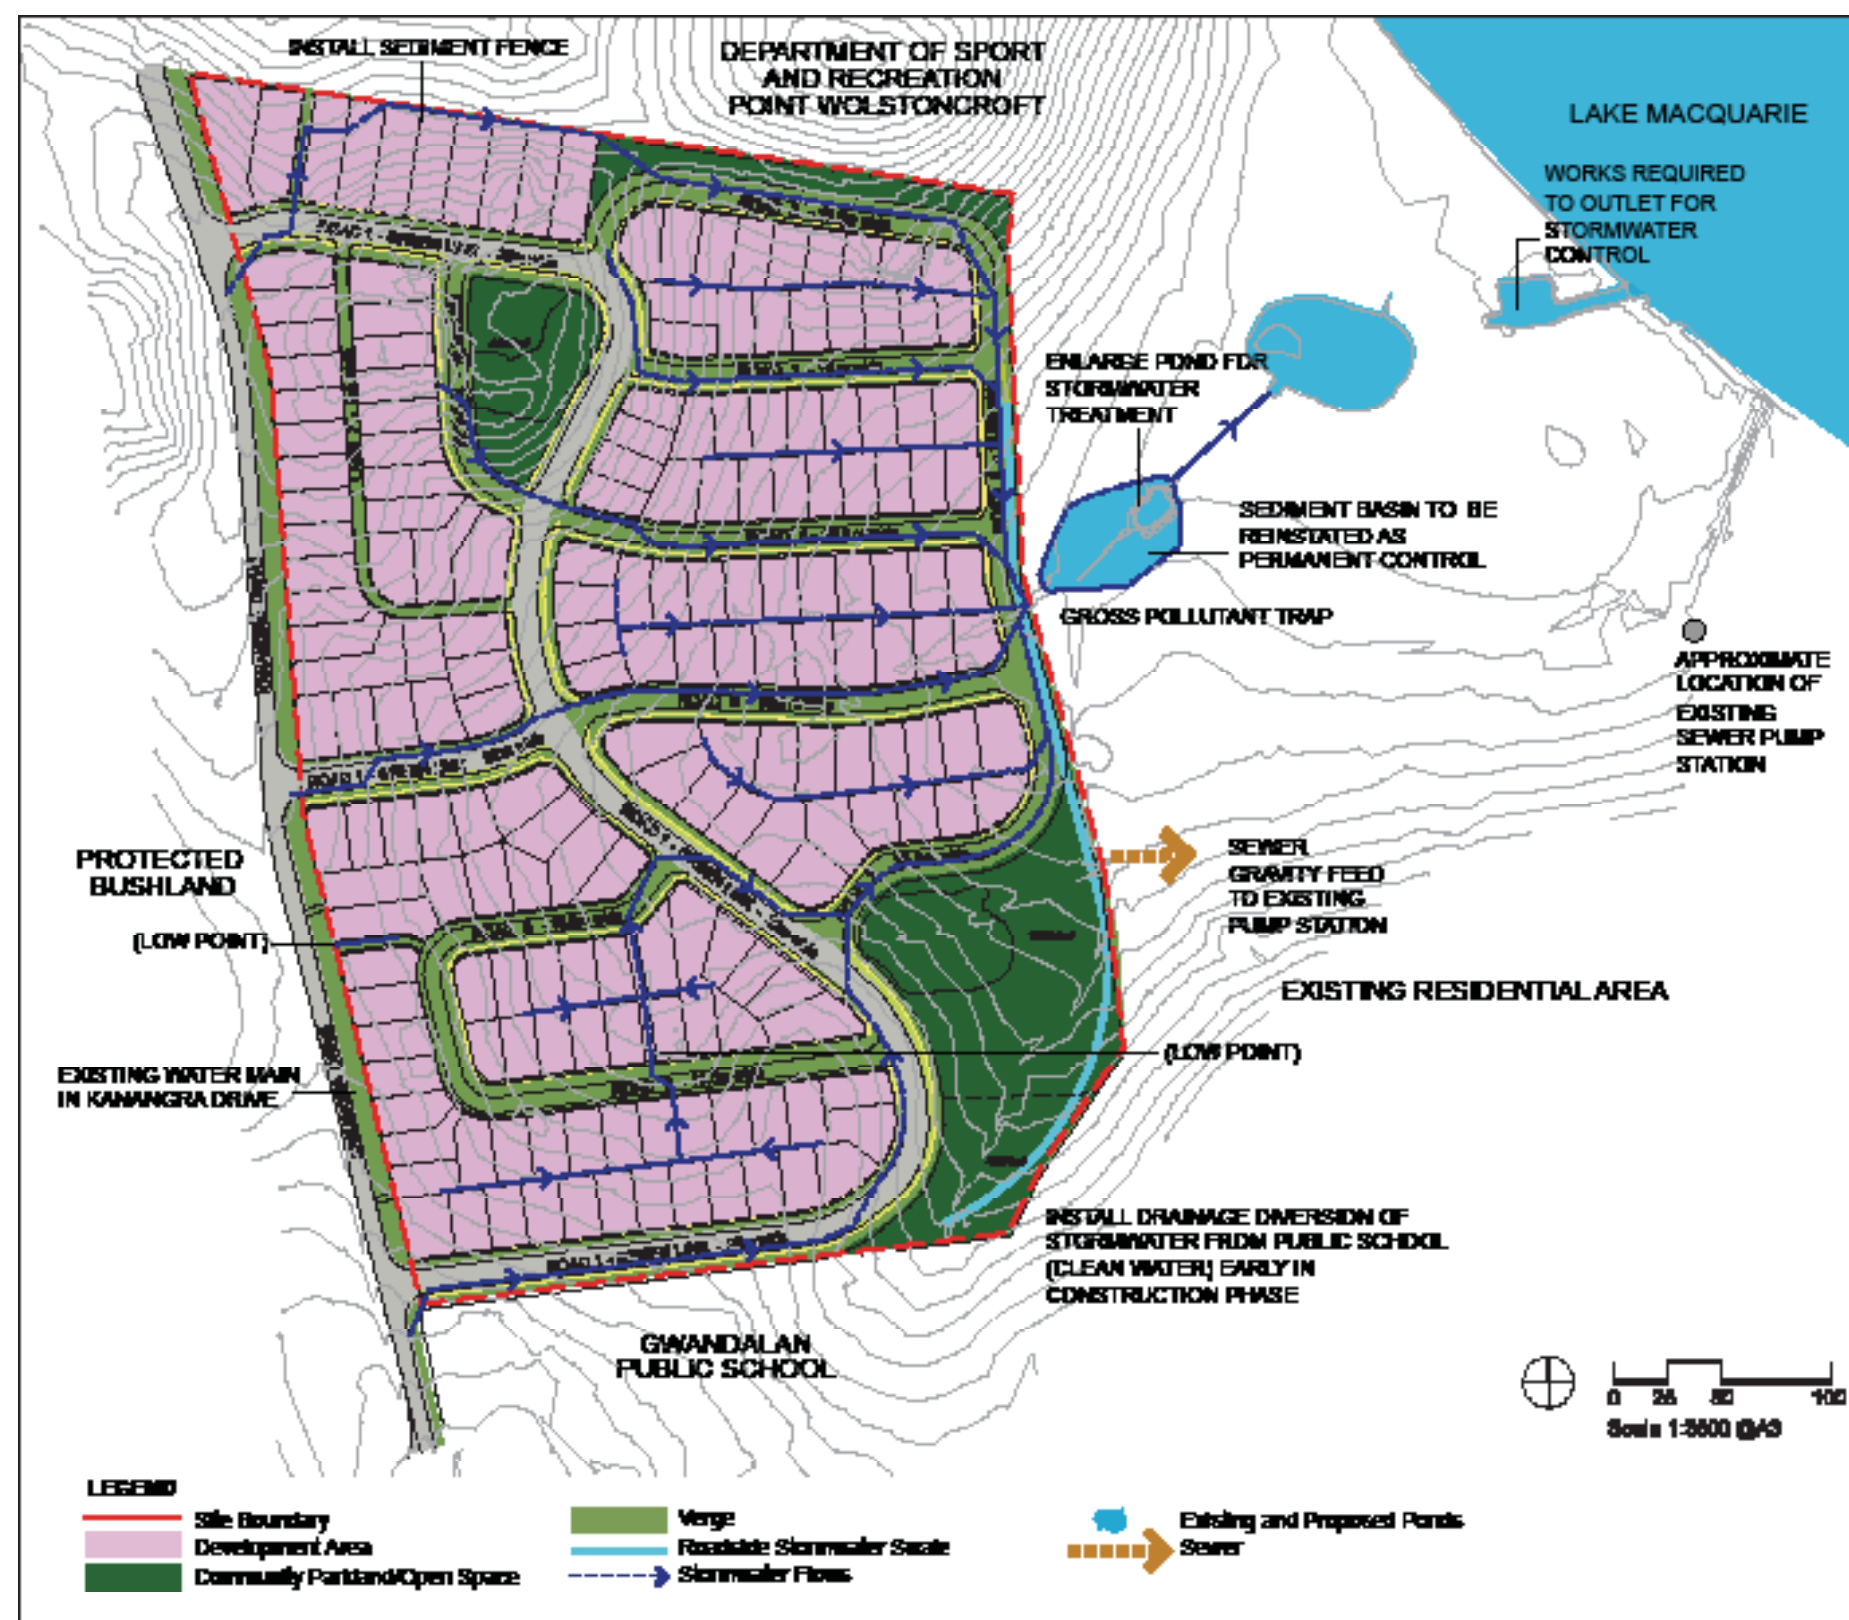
Gwandalan Stormwater, Sewer and Water Concept Plan.
